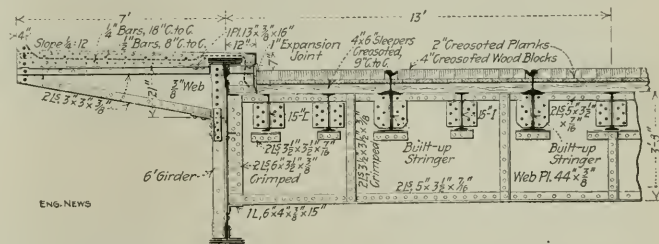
HALF CROSS-SECTION OF PLATE-GIRDER BRIDGES OVER THE WEST FORK OF THE NORTH BRANCH OF THE CHICAGO RIVER
